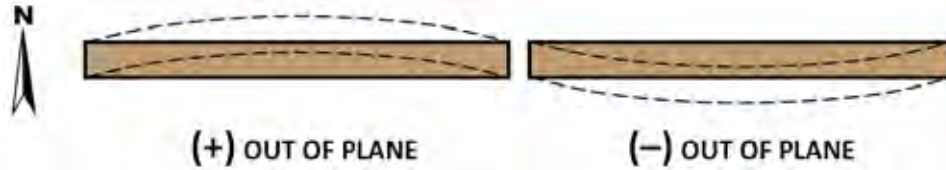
Plan View of Floor Beam Showing Out-of-Plane Bending Stress Sign Convention
